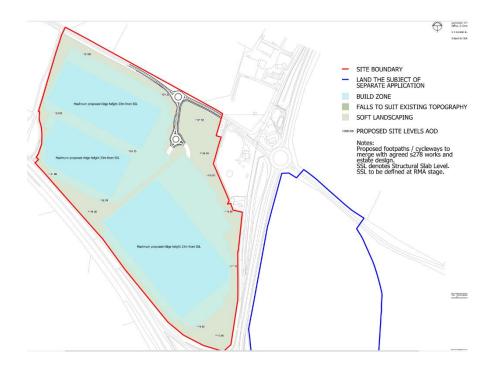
Extract of Western Site Building Heights Parameter Plan
